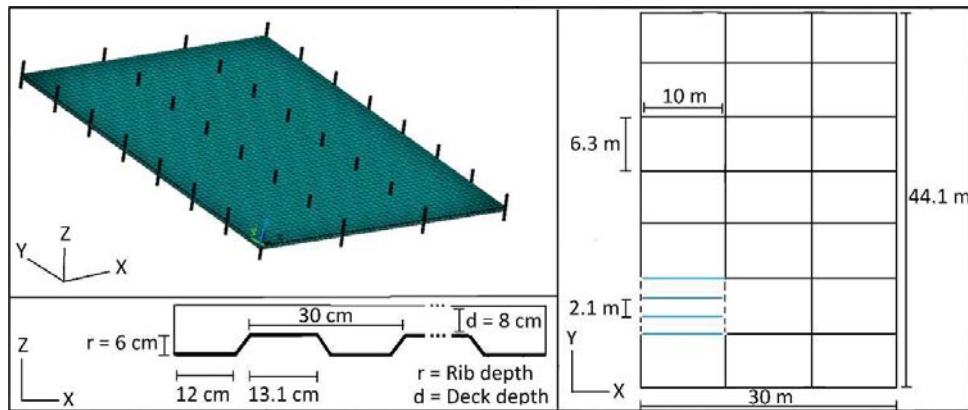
Office floor FE model (top left) and floor slab cross section (bottom left). Floorplan dimensions (right) with example secondary beams (solid blue) and primary beams (dashed red). Columns present at line intersections.
